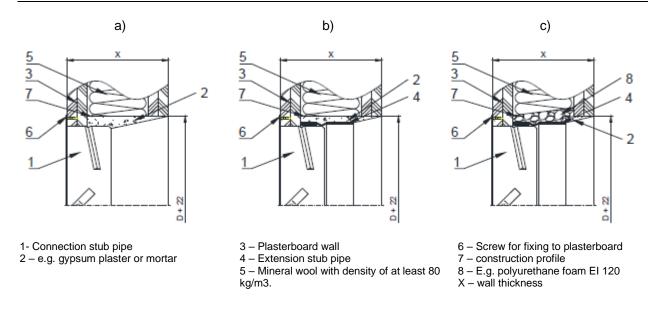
Sample setting of a connection stub pipe in a plasterboard wall
